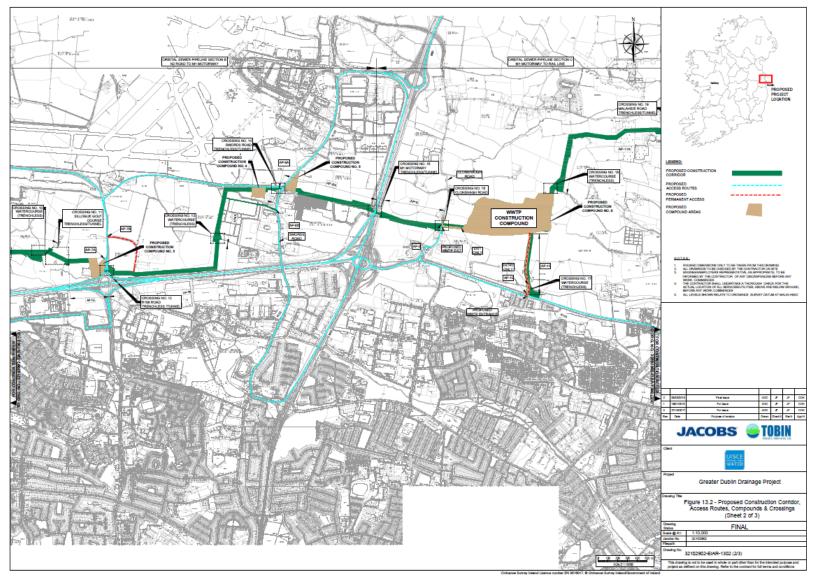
Proposed Construction Corridor, Access Routes, Compounds & Crossings, Sheet (2-3)
